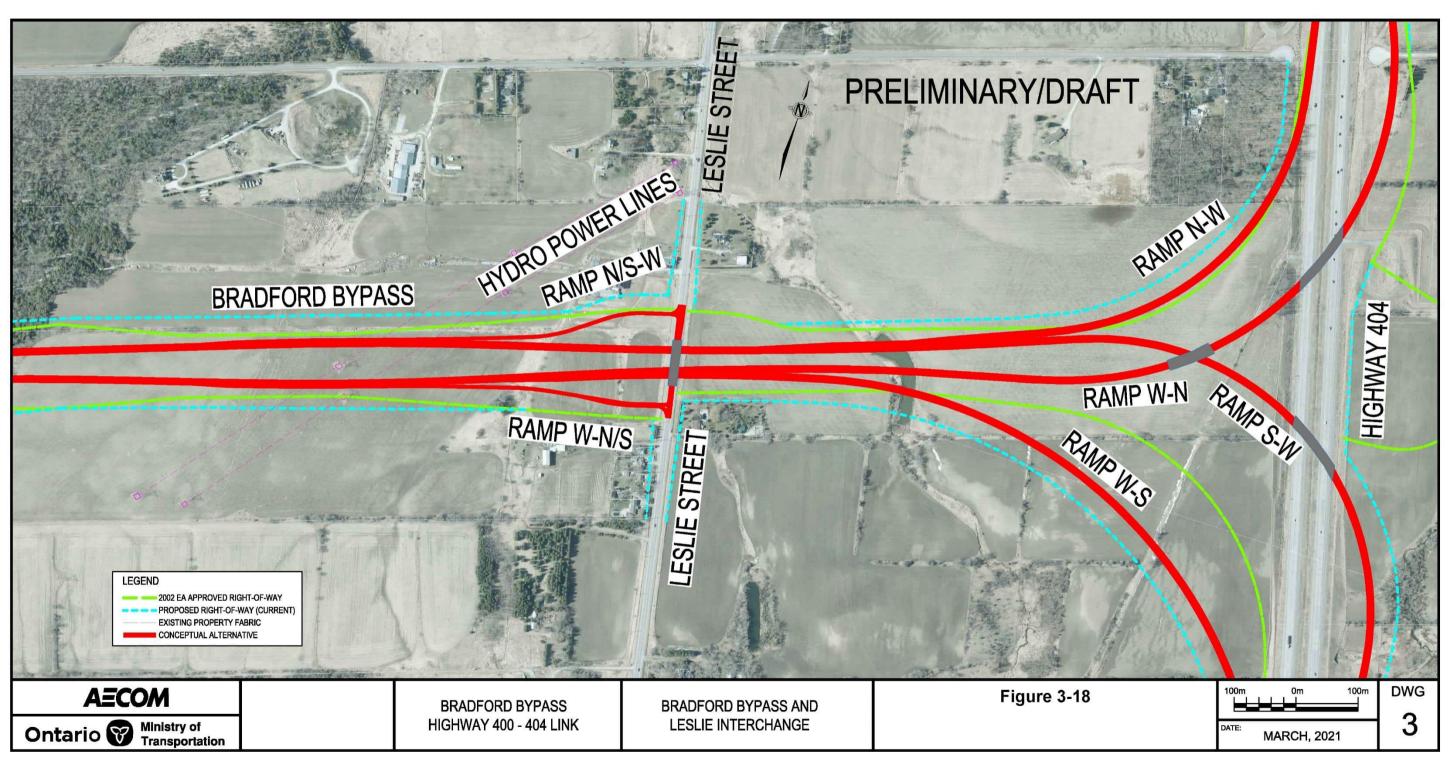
Split Realignment of Bradford Bypass Lanes West of Leslie Street (Eastbound to the South; Westbound to the North) (Alternative 3)
